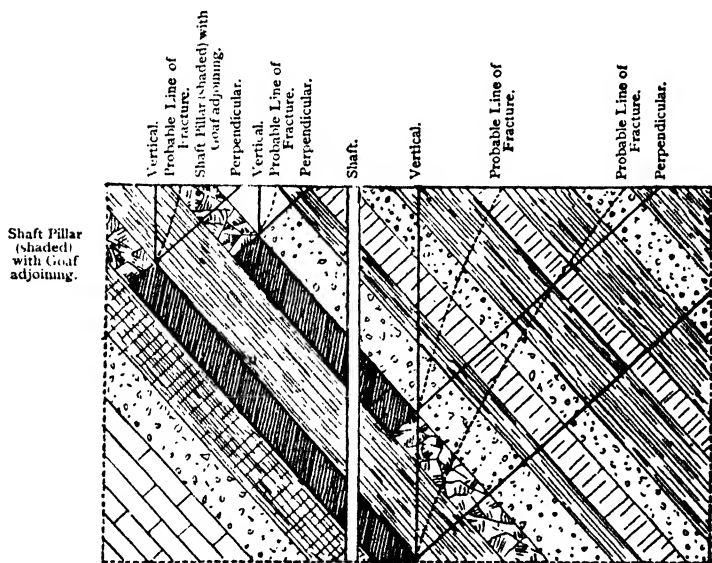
SECTION SHOWING COAL LEFT TO SUPPORT SHAFT IN AN INCLINED SEAM.
